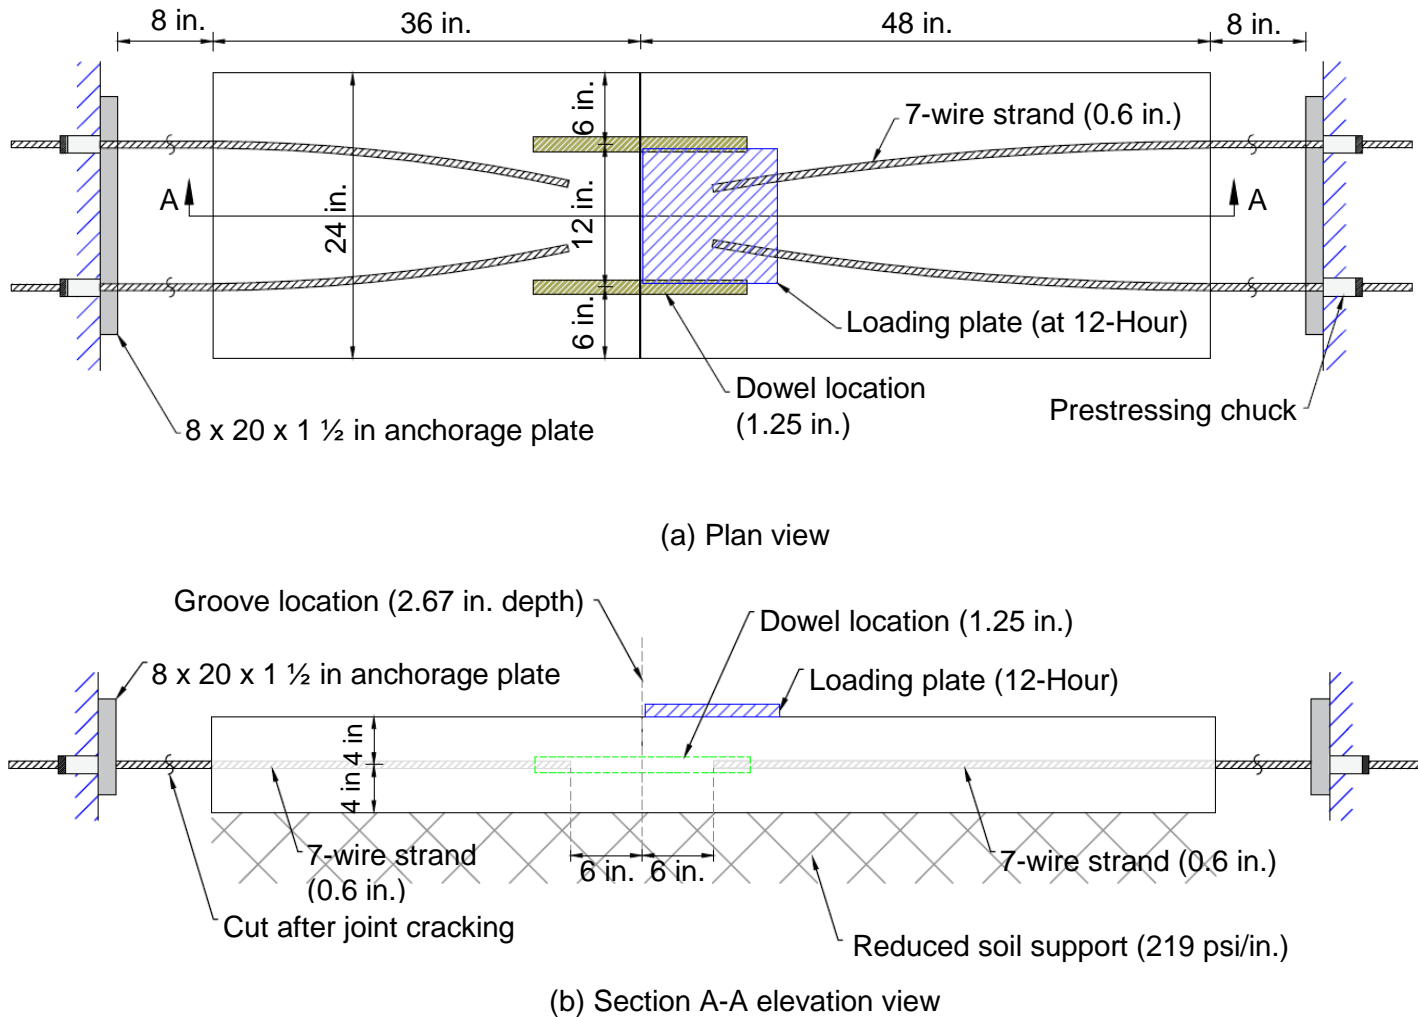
Specimen #5 testing setup showing anchorage system in the plan view (a) and the elevation view (b).
